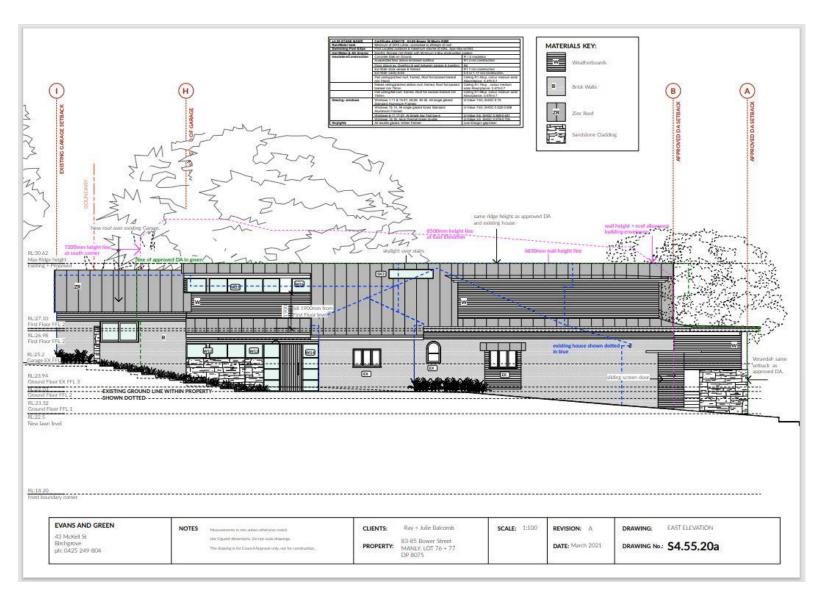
D - Section taken through eastern side of proposed amended dwelling house (see final revised architectural plans from Evans & Green 2021)
